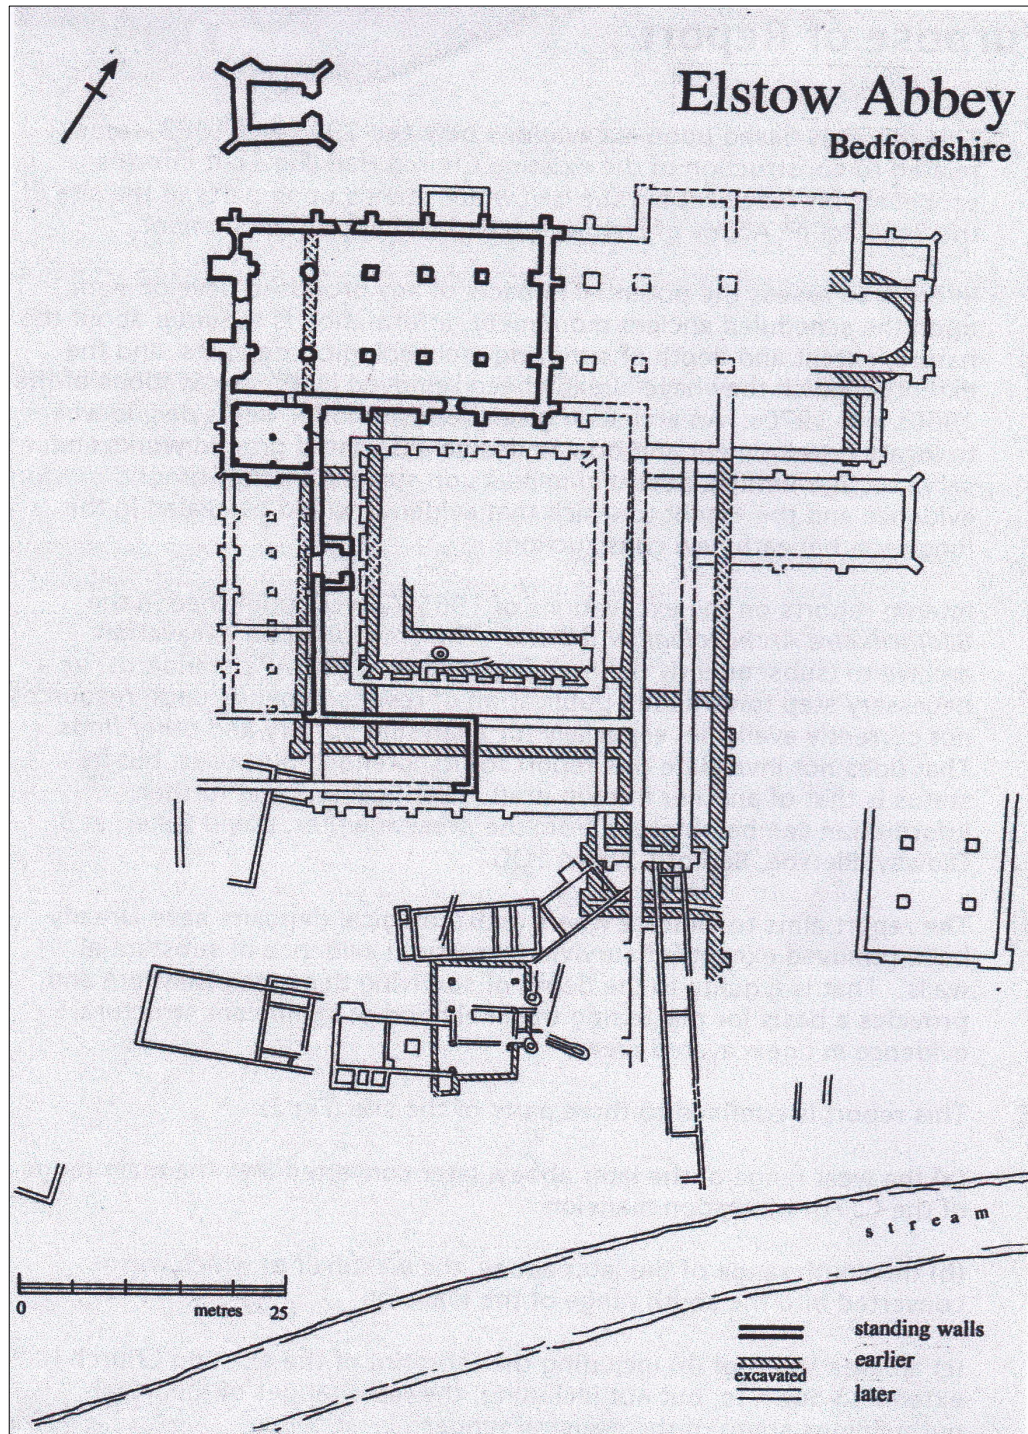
Site plan of Elstow Abbey following 1968-72 excavations (Courtesy of D. Baker)
